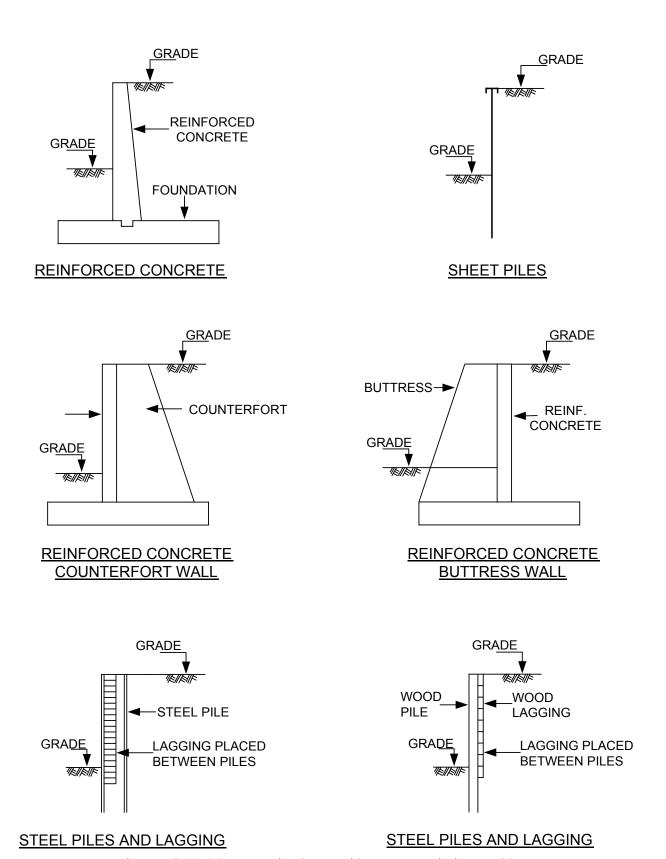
(b) Typical Cantilever Retaining Walls
